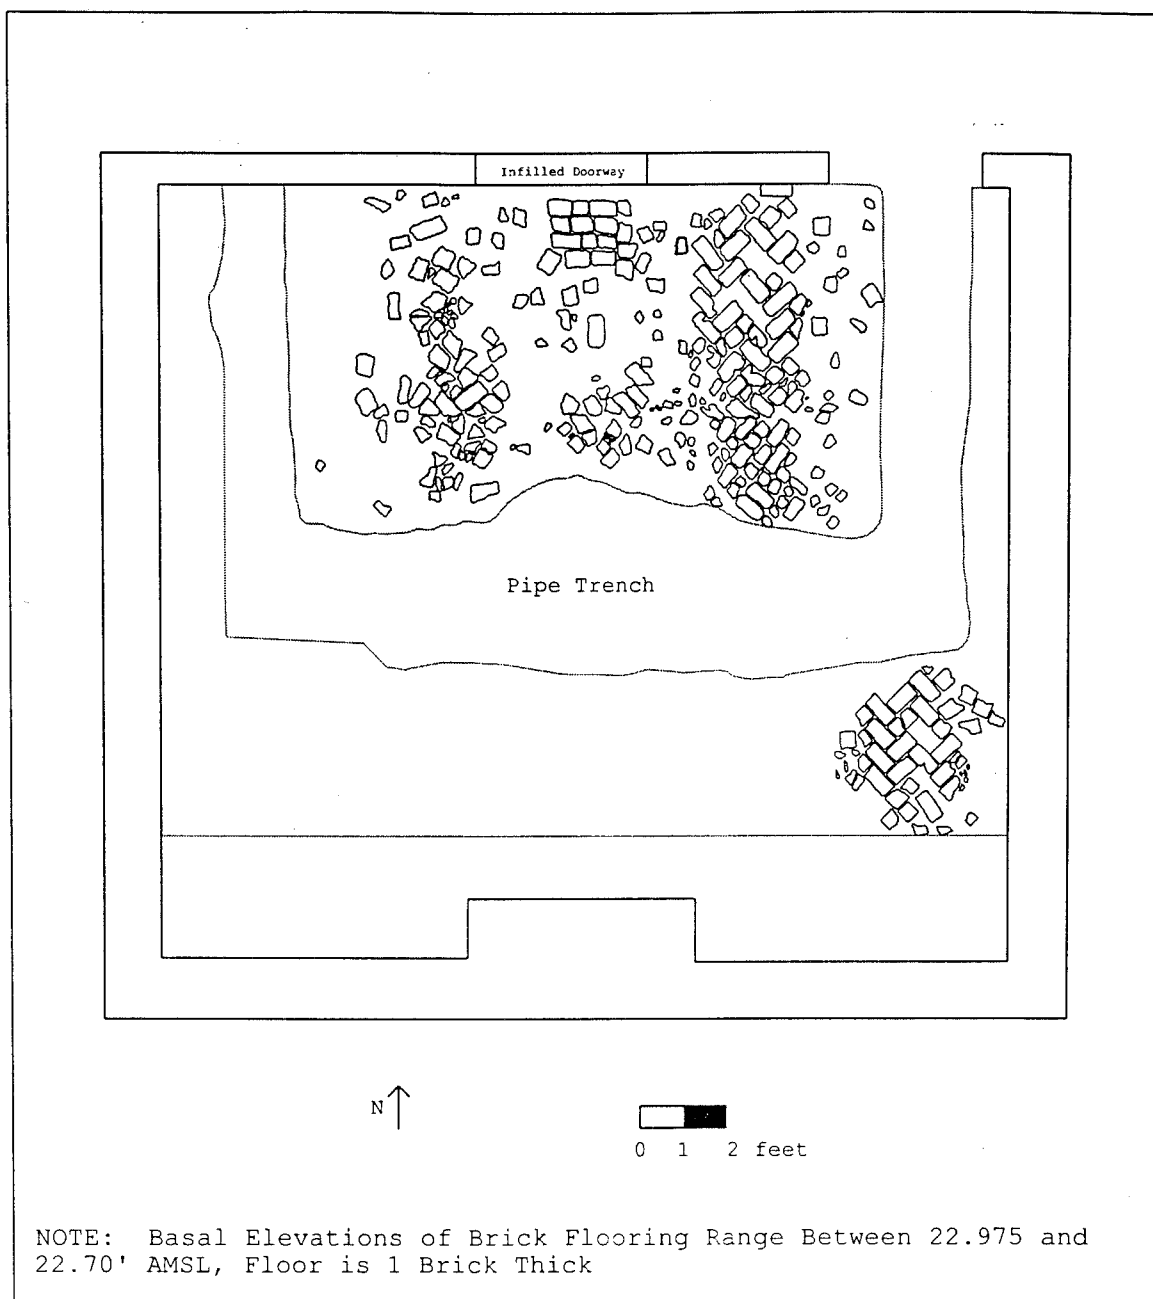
Planview of Brick Flooring (Stratigraphic Unit 1, Stratum 1) South of Masonry Dividing Wall. South Room, East Wing Interior
